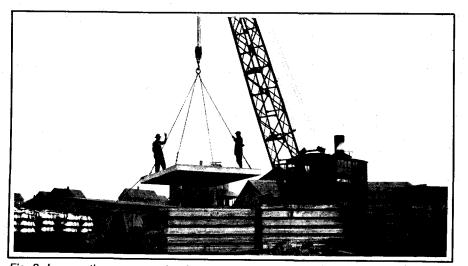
Locomotive crane storing floor slabs in the casting yard.
